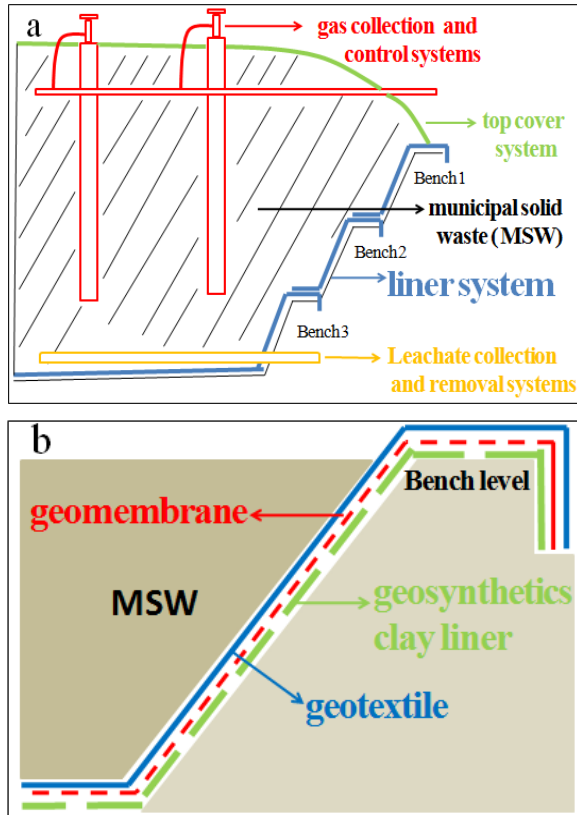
(a) The typical cross section of modern landfill, (b) The typical cross section of liner system.
